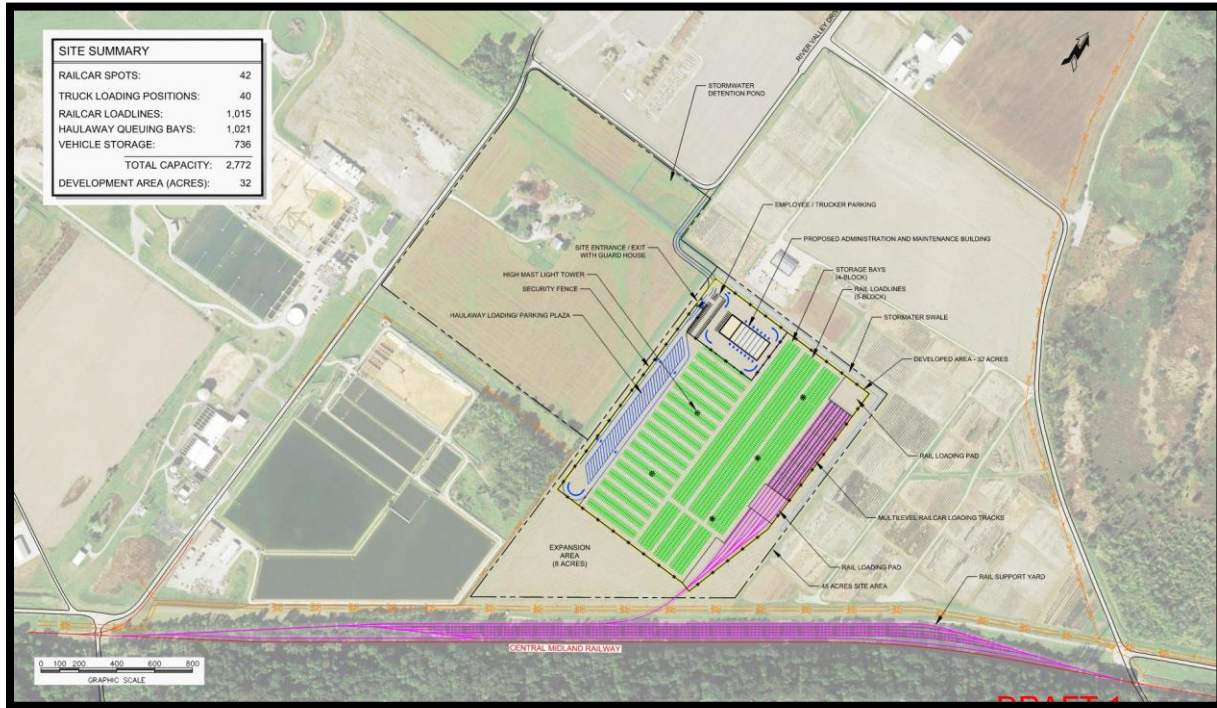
PRELIMINARY SITE PLAN - NEW VEHICLE PRODUCTION STORAGE & LOADING FACILITY (Provided by Others)
